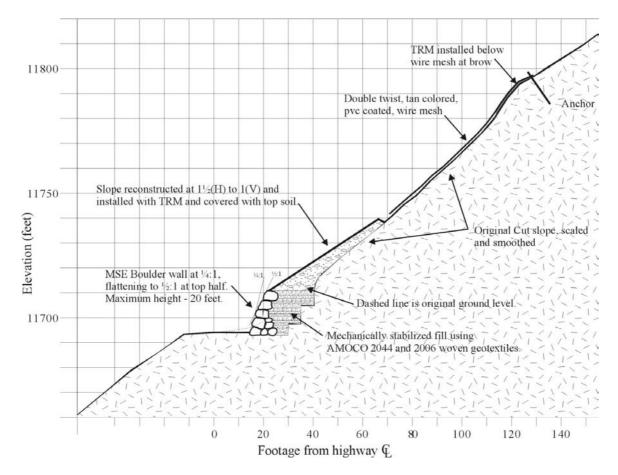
Schematic of slope-reconstruction design at the Big Cut.
